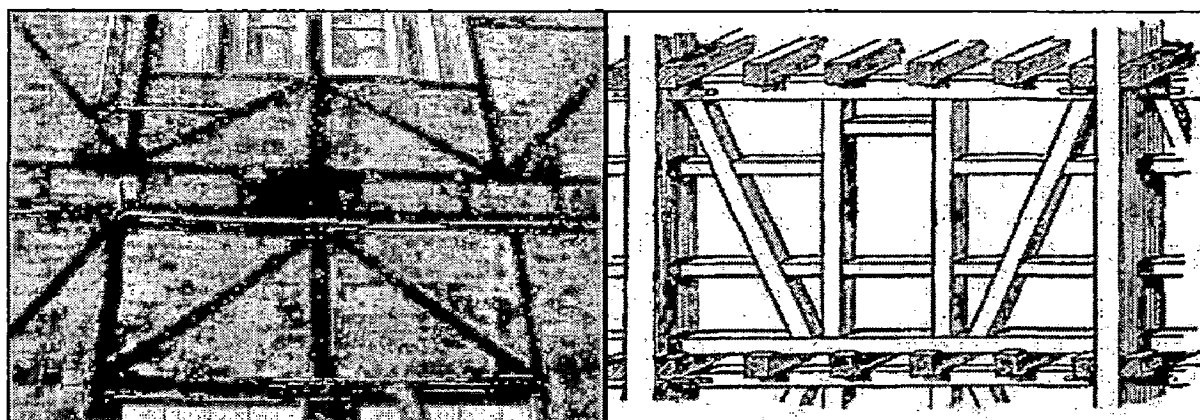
Wooden bracing in Dhajji wall system and system of wooden framing
